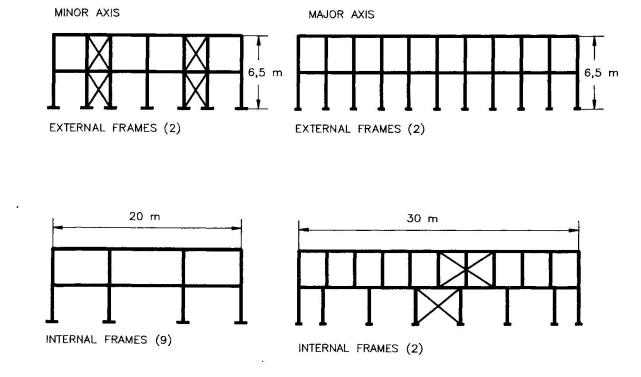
Schematic drawings of structrual frames for building # 11.
